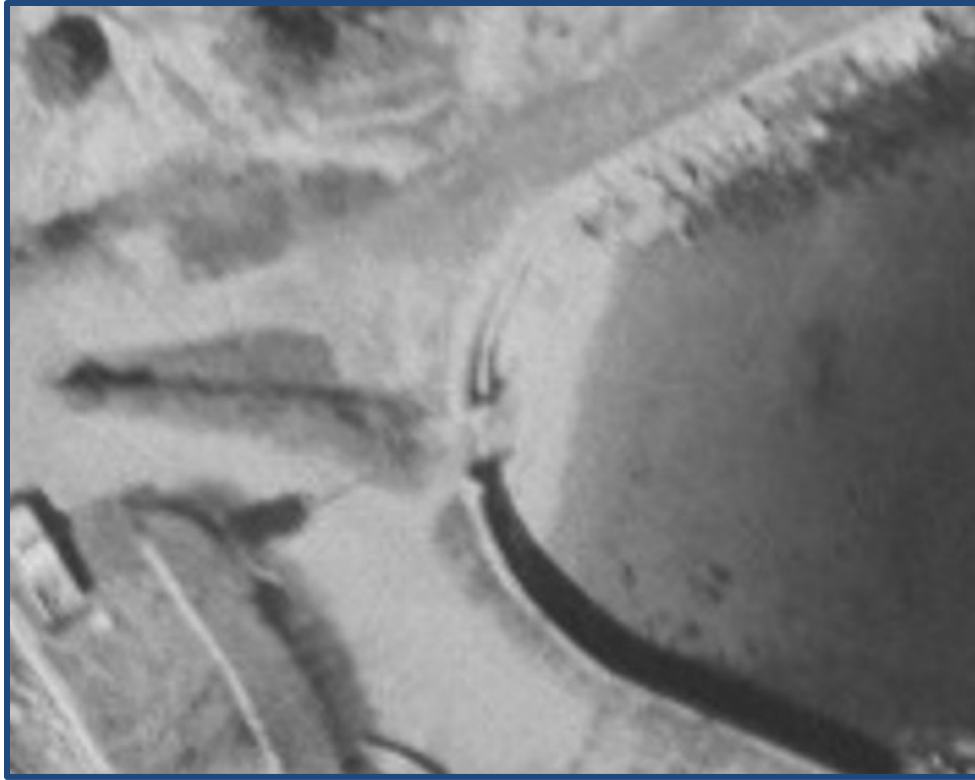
2004 Aerial Photograph, Shadows Make Lower Wall Visible
